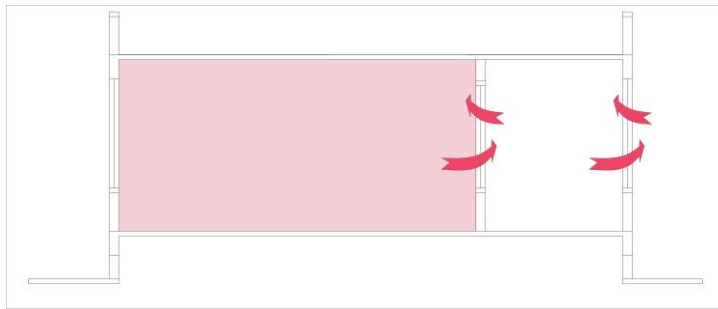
Classroom and corridor cross-section – openings in corridors can support air exchange in classrooms
